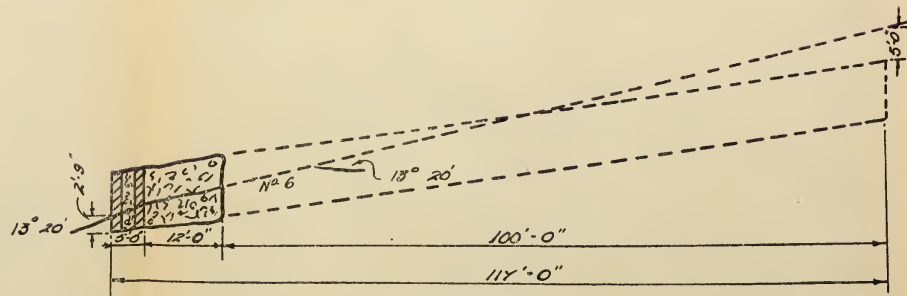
ARRANGEMENT OF PIPES IN AN UNDERGROUND DAM IN A DRIVE.
